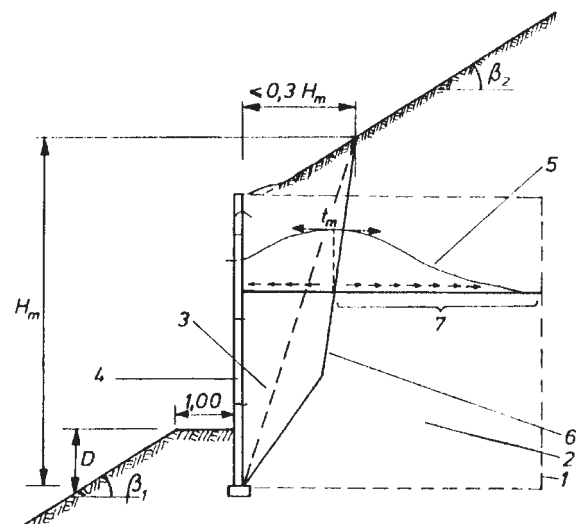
Calculation scheme of reinforced soil structure (according to [1, 3]): 1 - reinforced soil mass, 2 - bars anchoring zone, 3 - reinforced soil active zone, 4 - structure head lining, 5 - values of reinforcement element stretching, 6 - distribution of values of stretching along reinforcement, 7 - maximal stretching line, 8 - bar anchoring section
